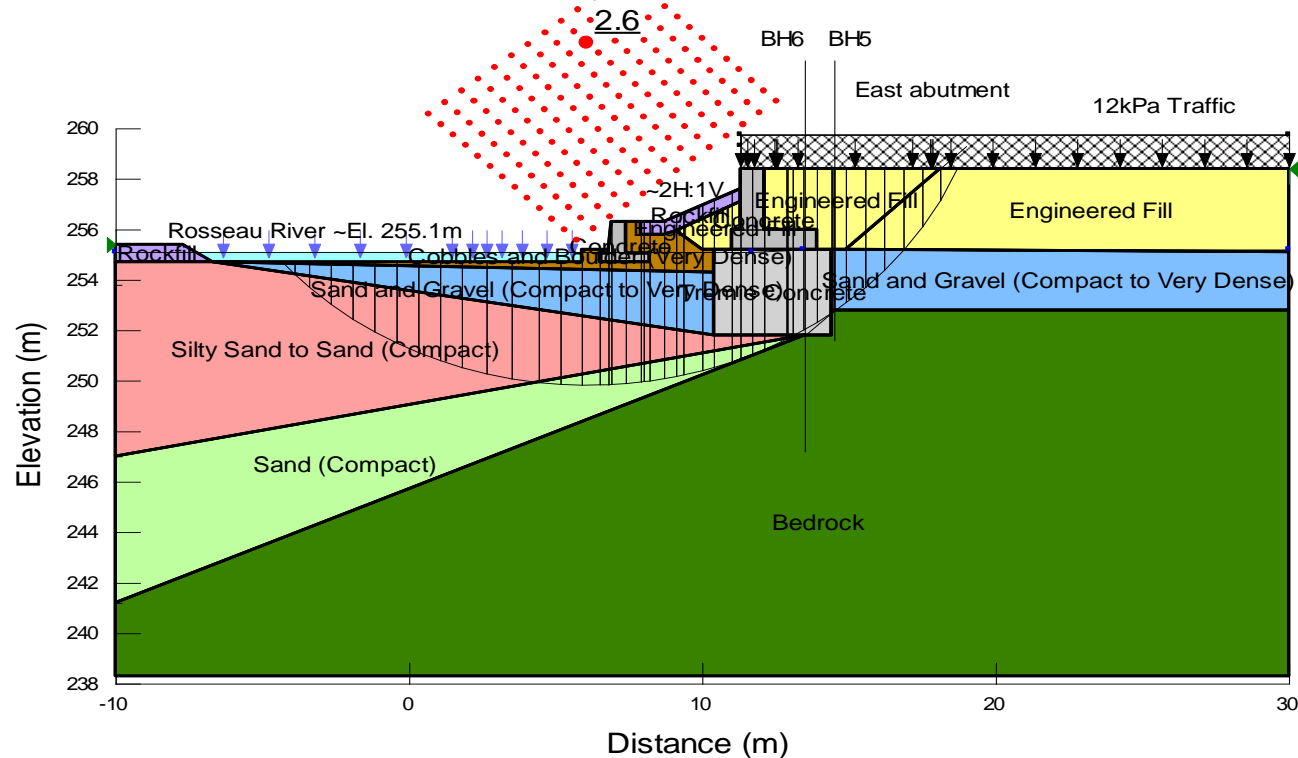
East abutment - drained seismic condition with tremie concrete pad option
